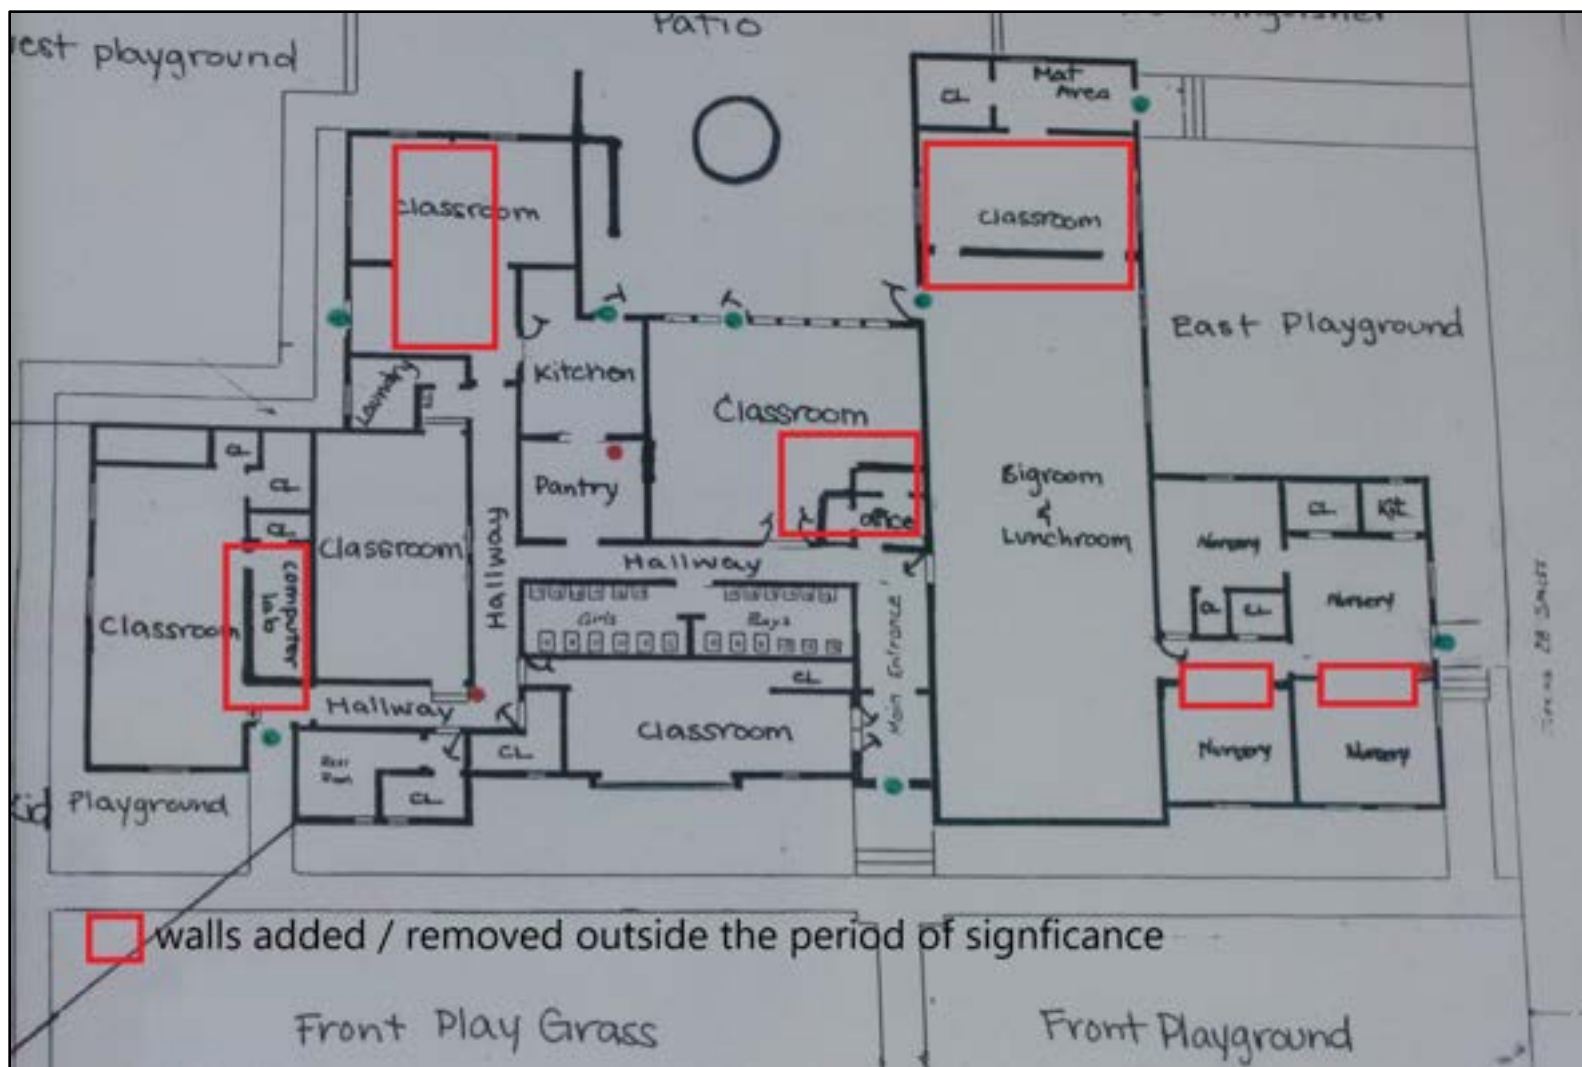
Recent floor plan of the existing daycare and early education facility with added or removed walls marked in red.
